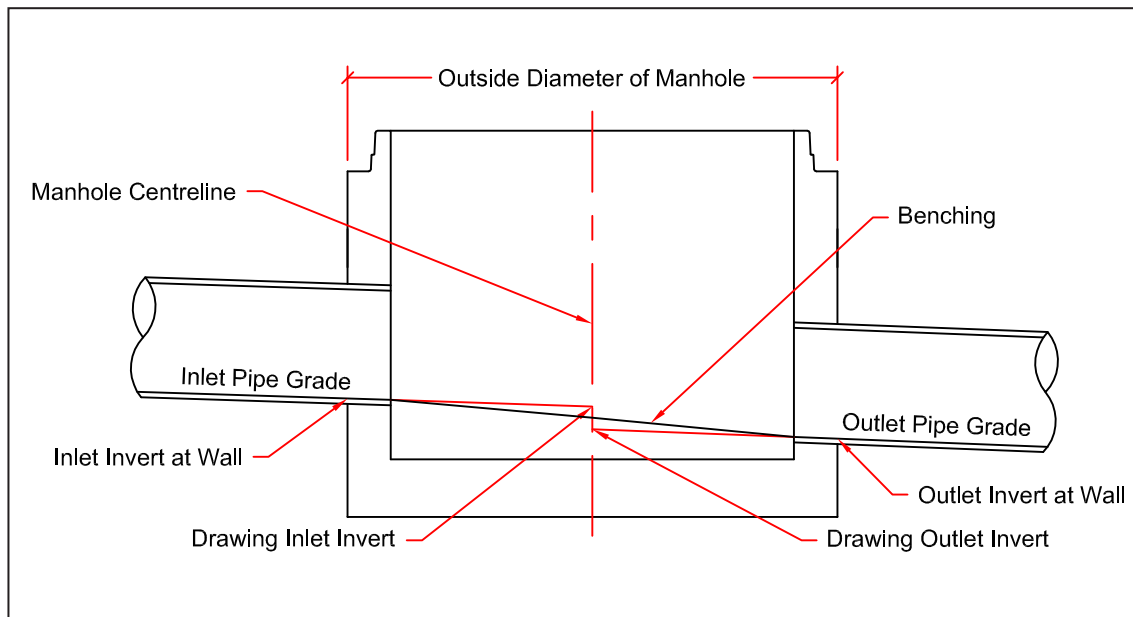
Typical Manhole Base with Adjusted Invert Elevations
